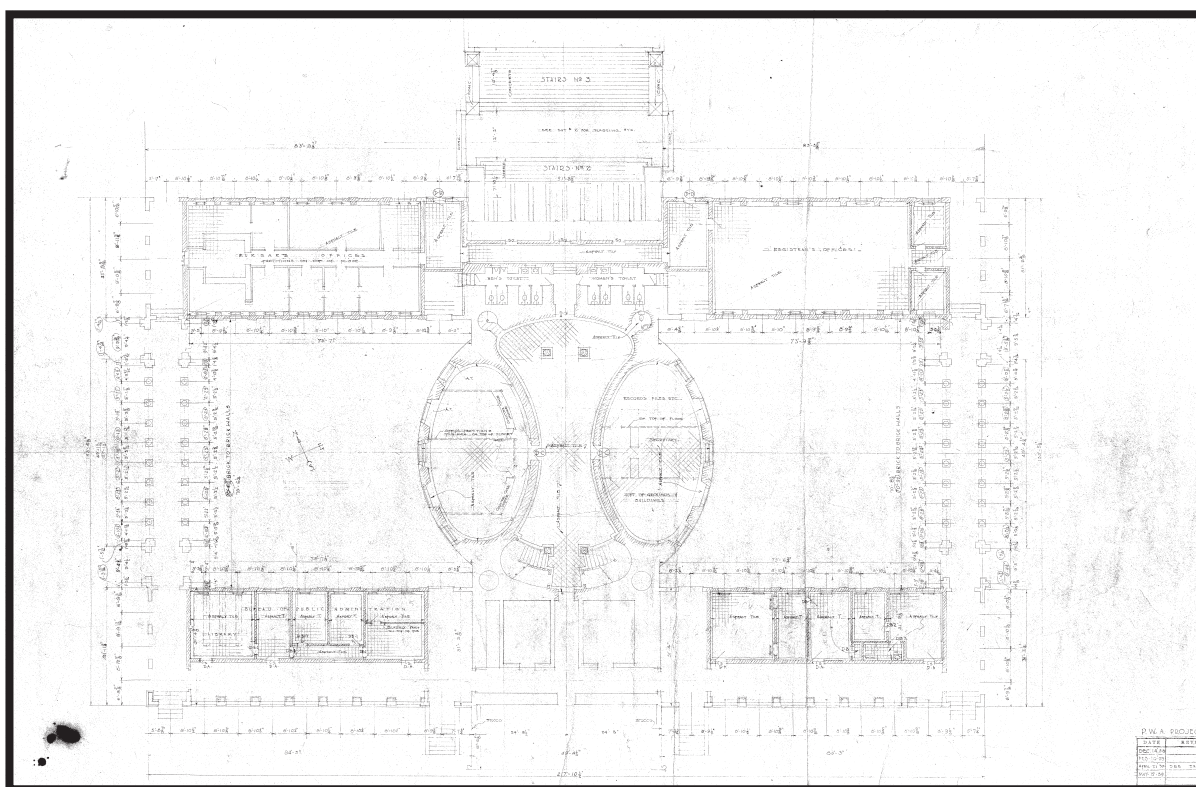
Stanislaw J. Makielski, ground-floor plan of the Rotunda, 1938-1939, showing the wings.
